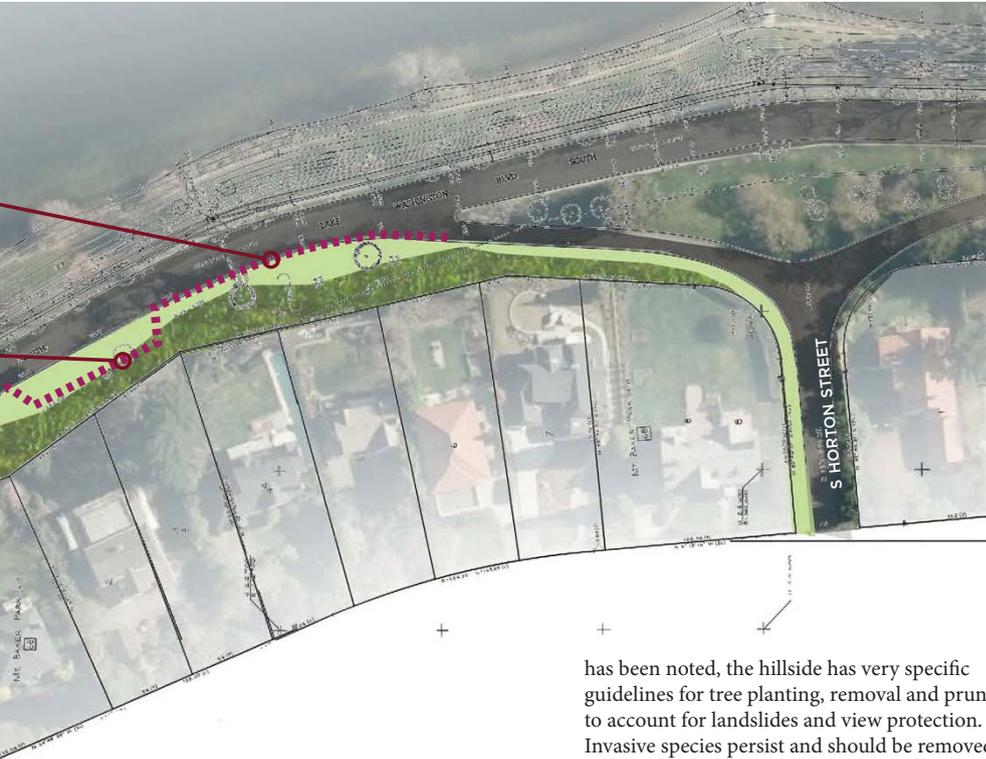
PROPOSED REHABILITATION SITE PLAN (HORTON STREET SEGMENT)
